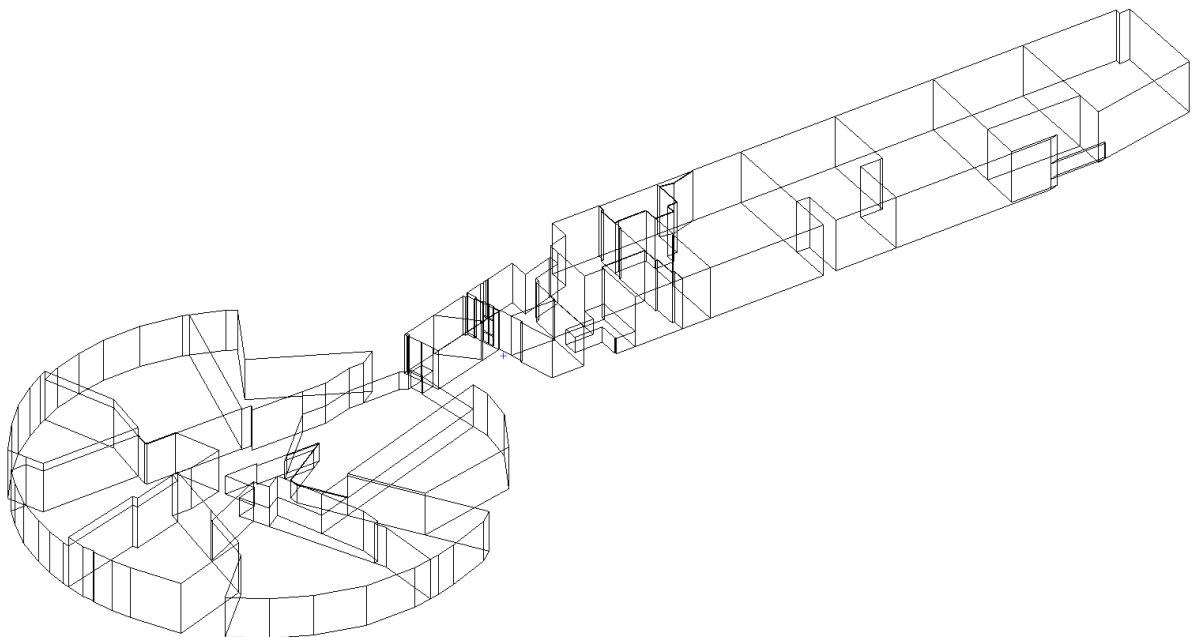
F2050 reconstruction of 26 ground floor scans w/ blinds down
